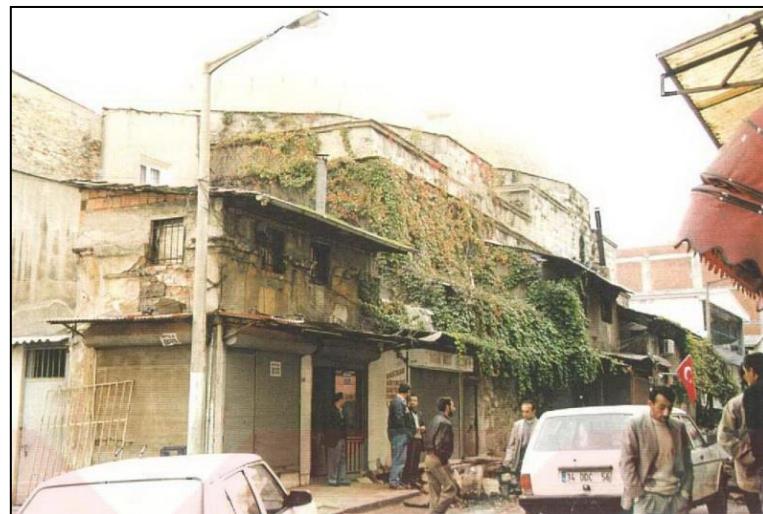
Zeyrek Çinili Bath, northwest elevation
